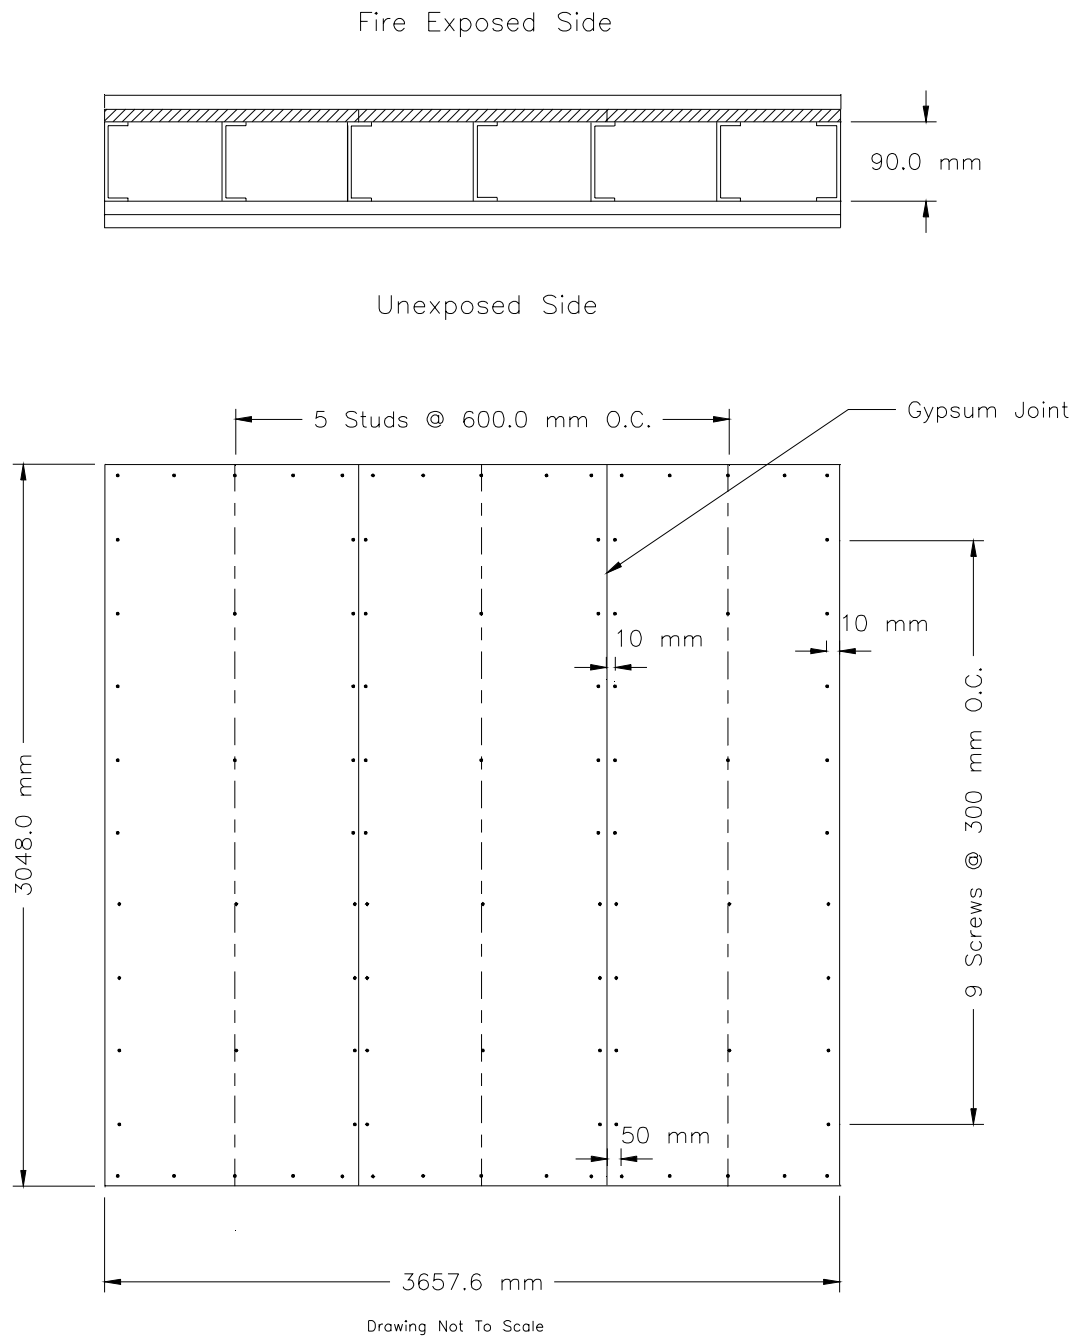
Screw Locations For Steel Stud, 2x2 Gypsum Board layers, Full-Scale Assembly (Base Layer, Exposed Side)
